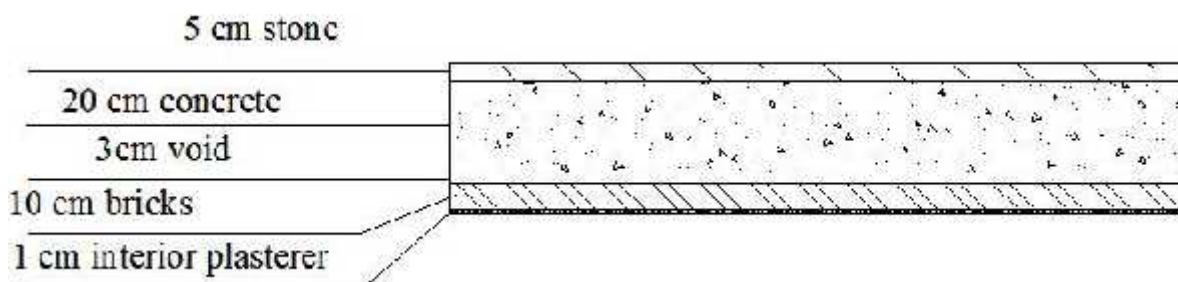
Cross-sections in outer wall for class 8. [12]
